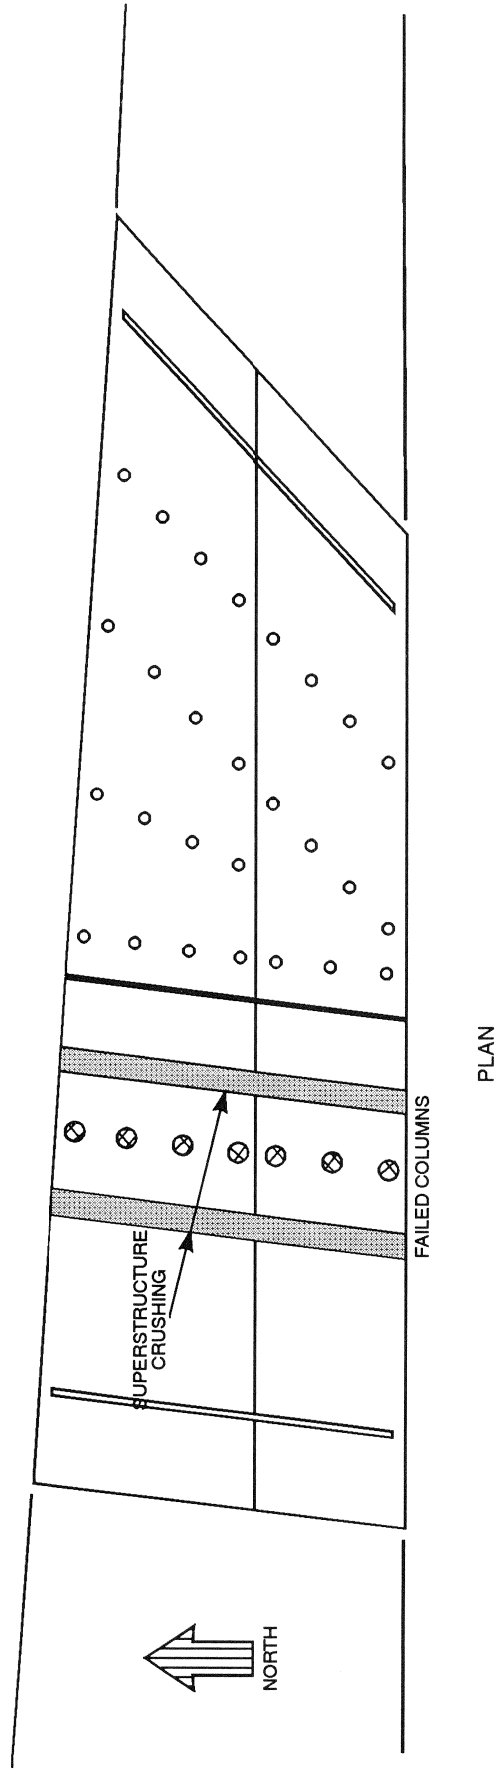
Fairfax-Washington Undercrossing -
